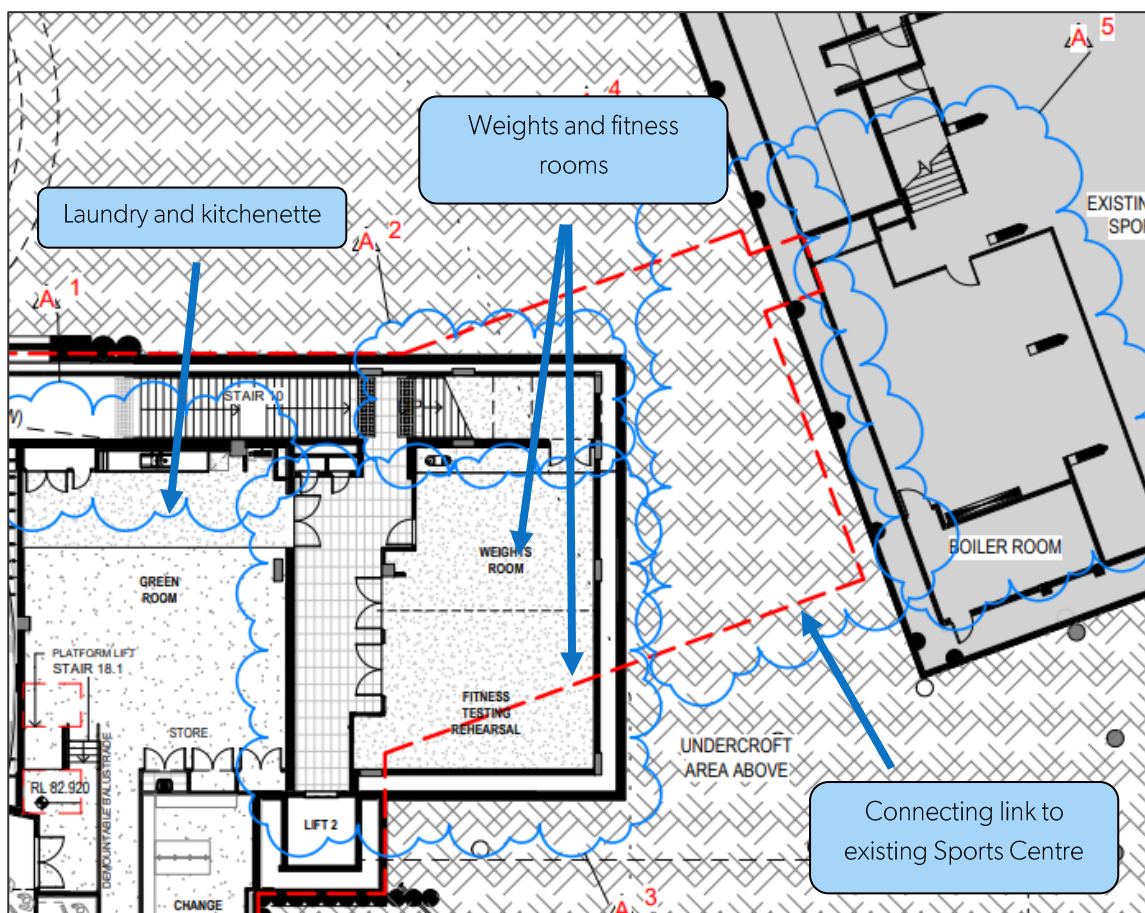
Proposed RPAC floor plan level 3 (MOD 2) (Source: Applicant's Modification Application 2019)
